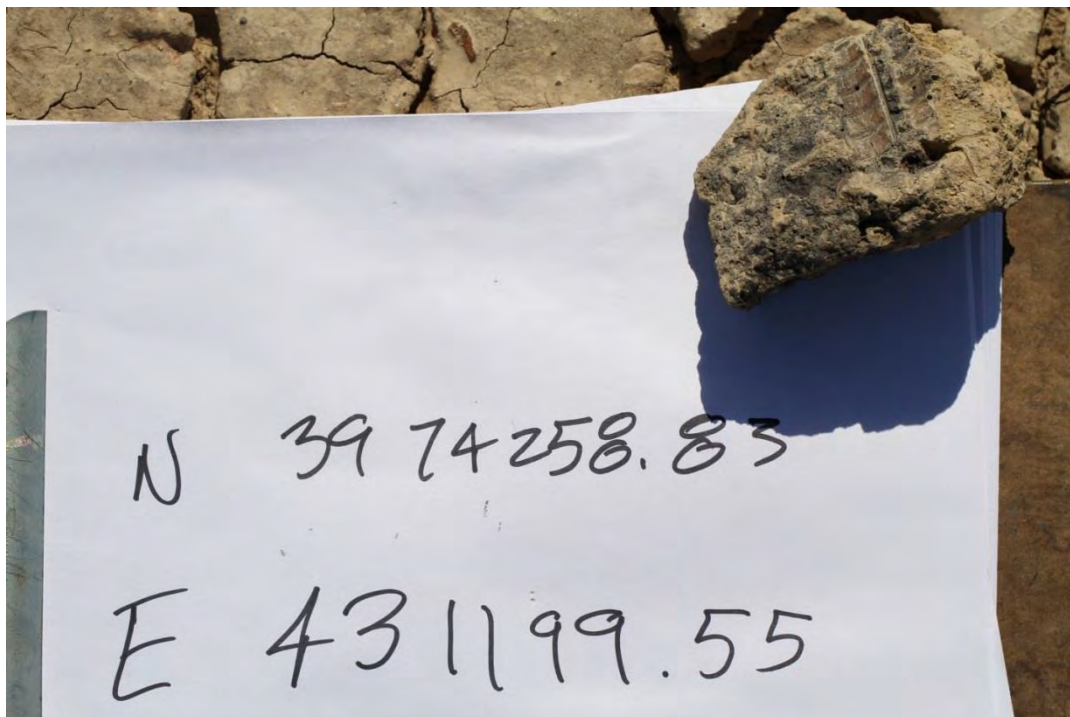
Fragment From East Wall That Traveled 122 m and Weighed 310.1 g (Test 4).
